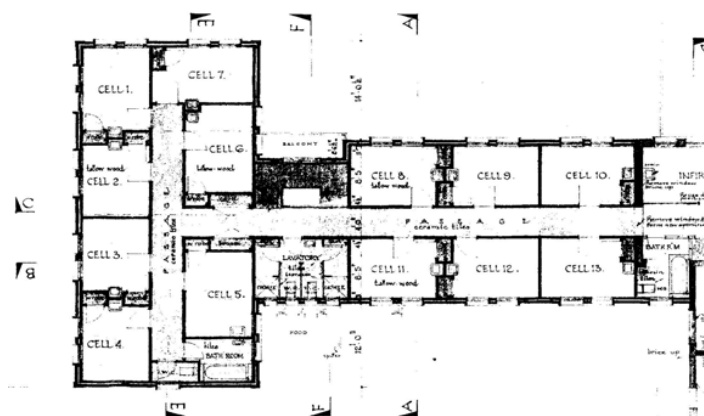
Architect's 1961 plan of the first floor of the Novitiate wing. (Sisters of Mercy, Bathurst Congregation)
